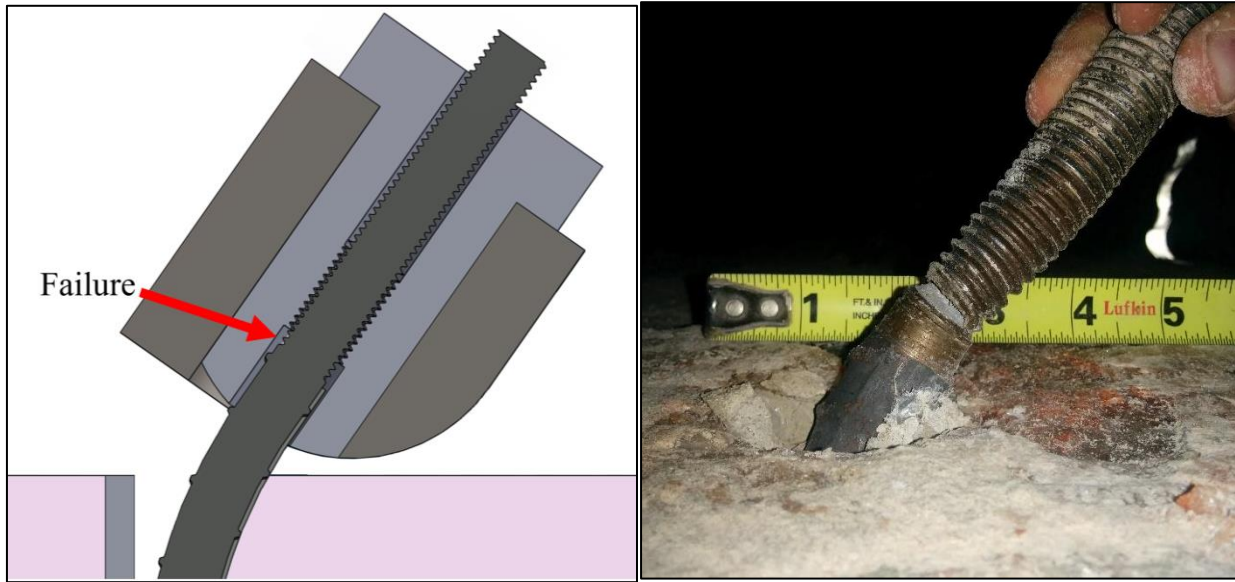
Cross-section diagram of failure point on all threaded-head rebar samples in lateral pull tests (left) and photo of failed sample LPT-7R-023 (right)
